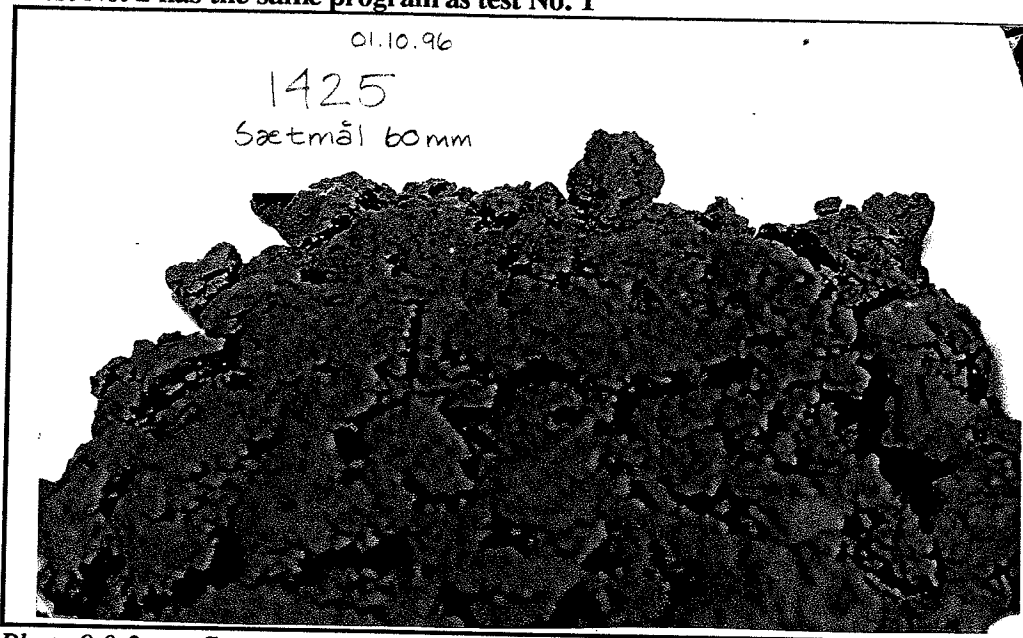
Concrete type used at test No. 2 (F2, negative No. 18)
